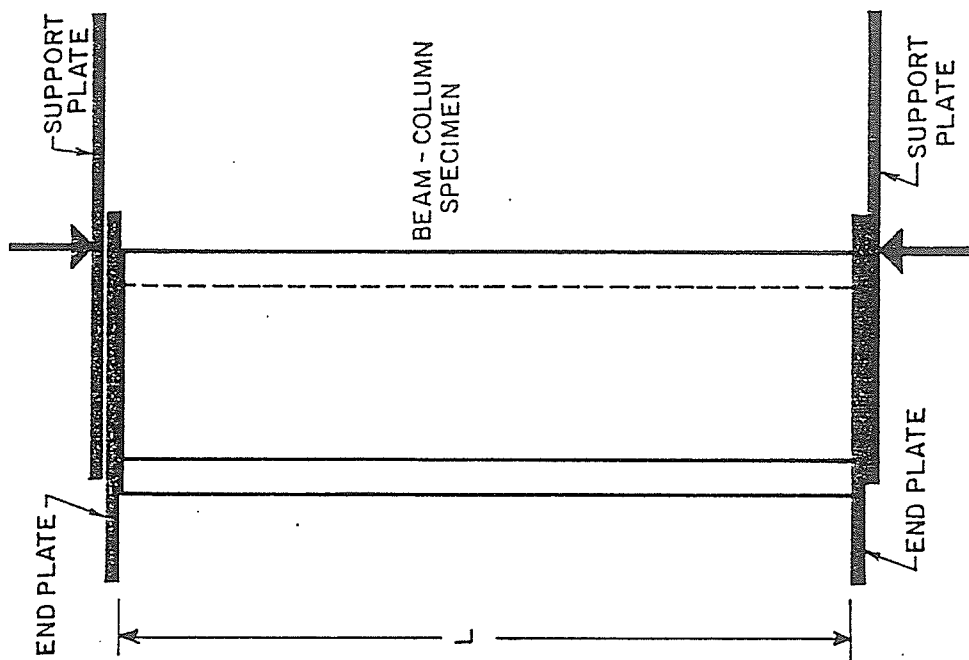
A Loading Diagram for the Beam-Column Tests
